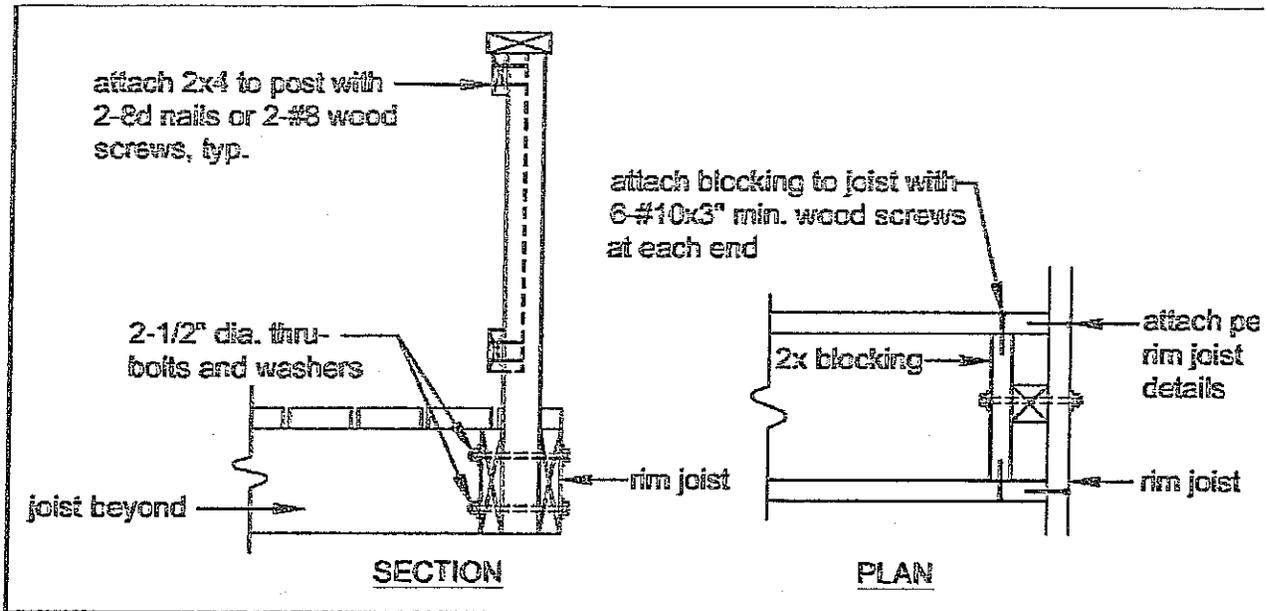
GUARD POST TO RIM JOIST DETAIL, OPTION 1
